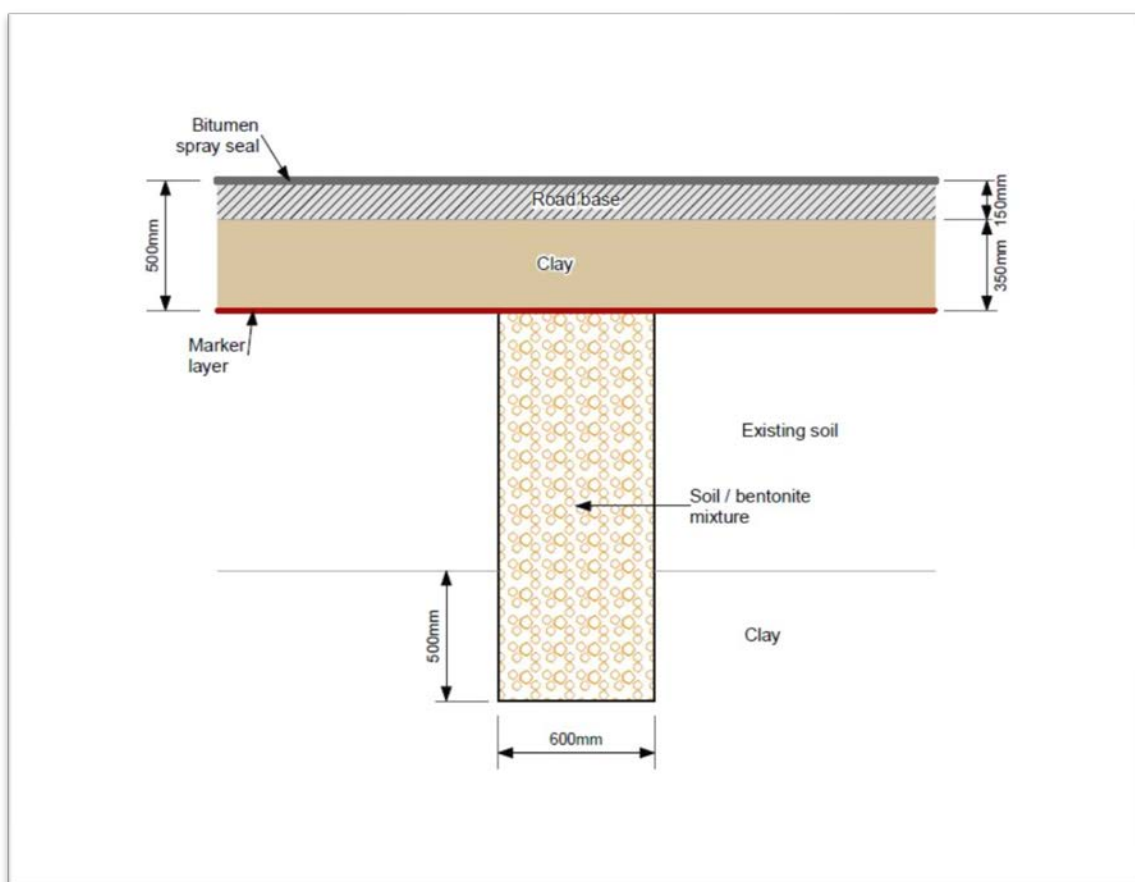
| Cross-section of subterranean barrier wall and capping layer
